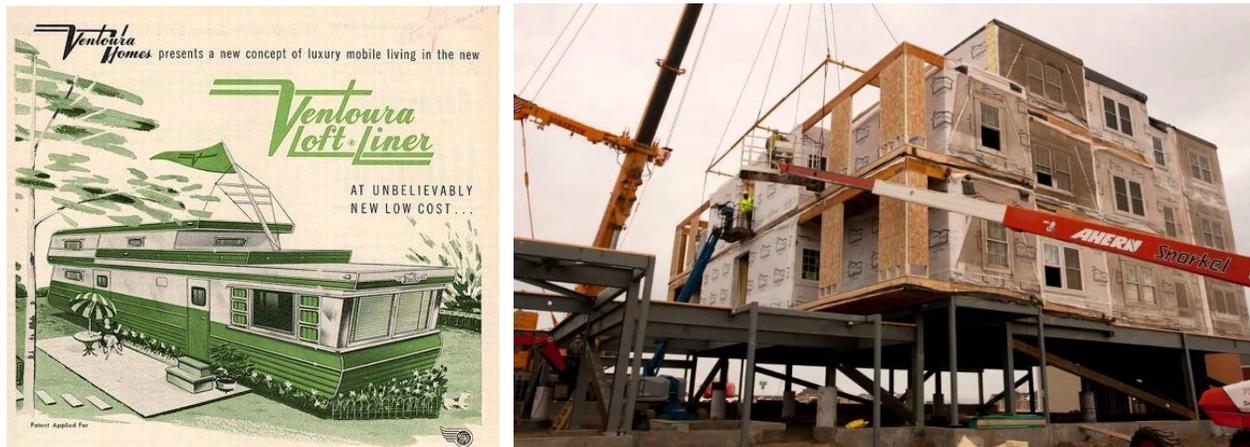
Example of 1960's prefabricated construction: single-wide mobile manufactured house (left). Example of a modern modular construction project: modular apartment building (right). (Catpal 2013, Champion 2013)
